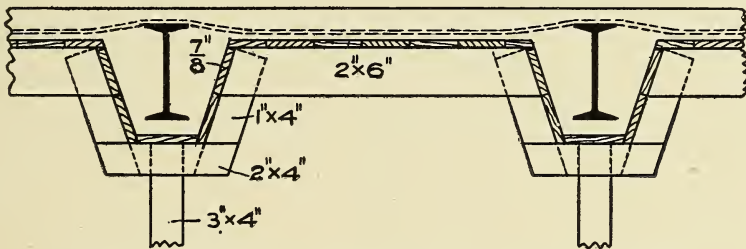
Forms for Reinforced-Concrete Slab Supported by I-Beams.
